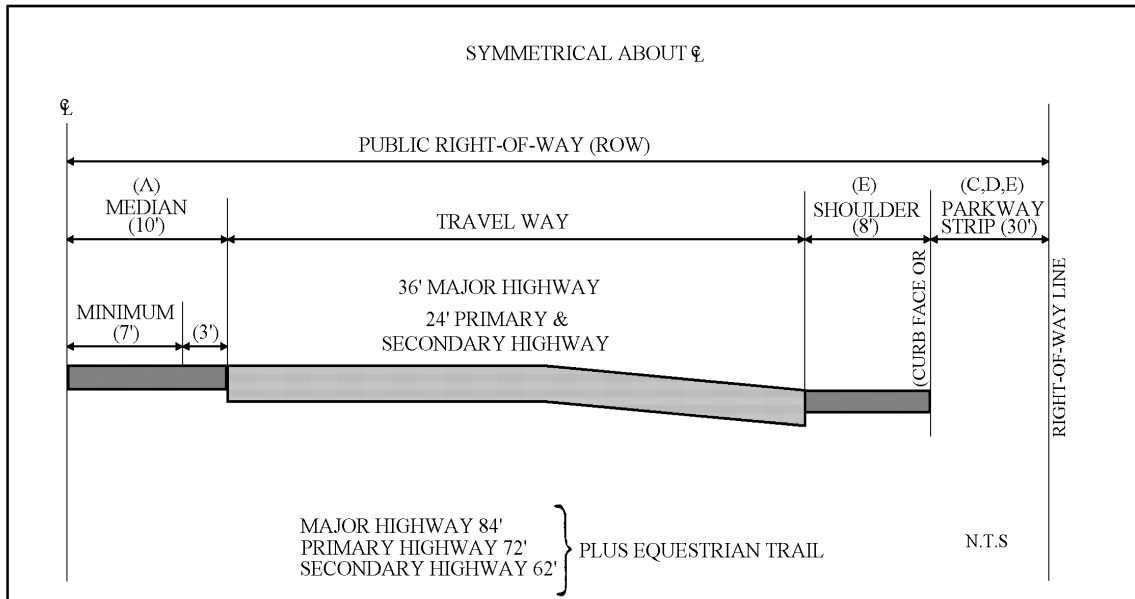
VIEWSCAPE HALF-SECTION (TYPICAL)
